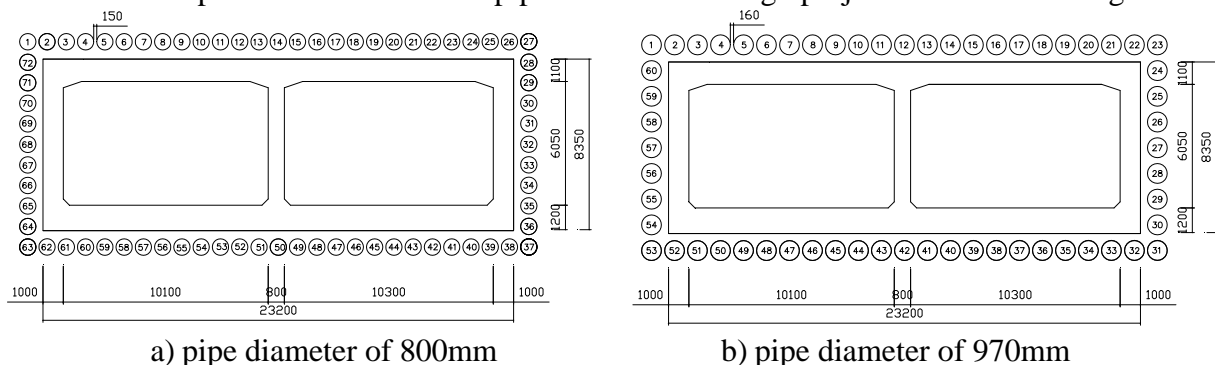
Plan of cross section of box culvert in pipe-roof at two design projects
